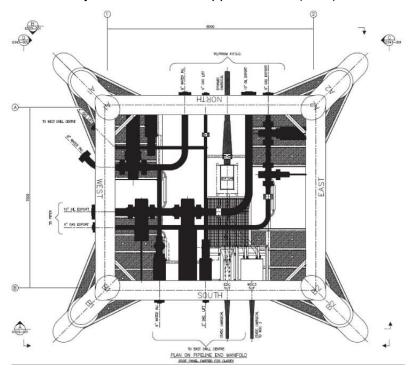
Plan view drawing of the MacCulloch development PLEM
